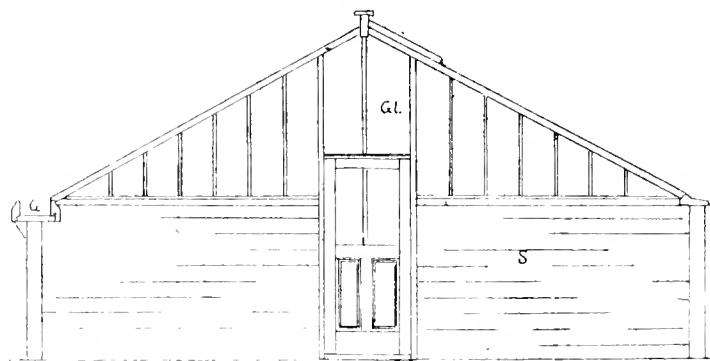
END VIEW OF A SPAN ROOF HOUSE. V. VENTILATOR. GL. GLASS. S. SIDING. G. GUTTER.
